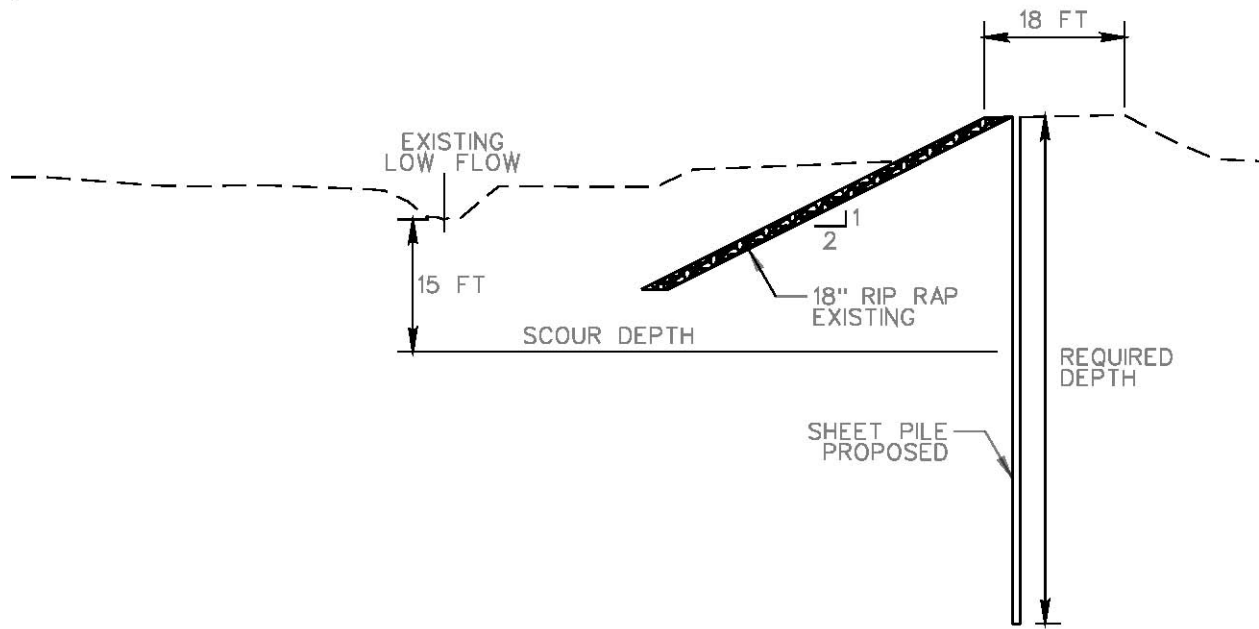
Typical Cross Section of Sheet Pile Component
